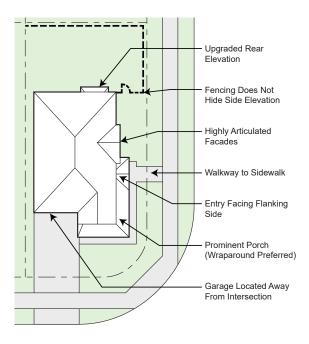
Conceptual plan view of Corner Lot Dwelling
